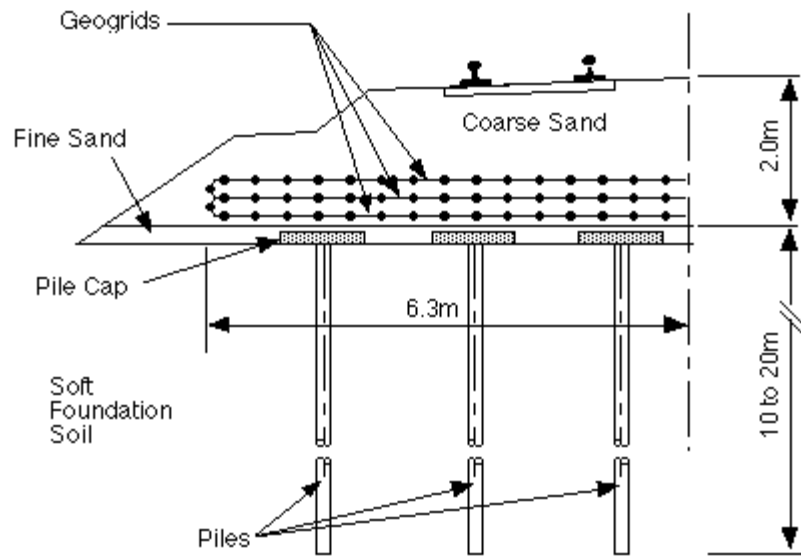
Geogrid reinforcement of a railroad embankment over soft foundation soil spanning pile caps, Alexiew, et al. (1995).
